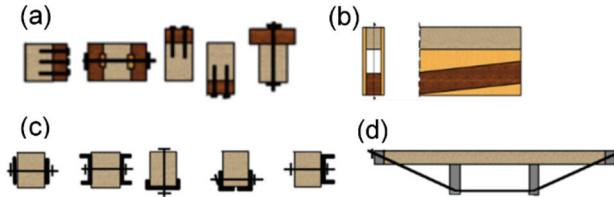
Timber floor strengthening methods: (a) Strengthening timber joists with nailed timber elements; (b) Forming of box girders; (c) Tension or bending elements connected to timber joists; (d) Enlarging the bending height with tension elements and spacer posts (redrawn from: [11])
